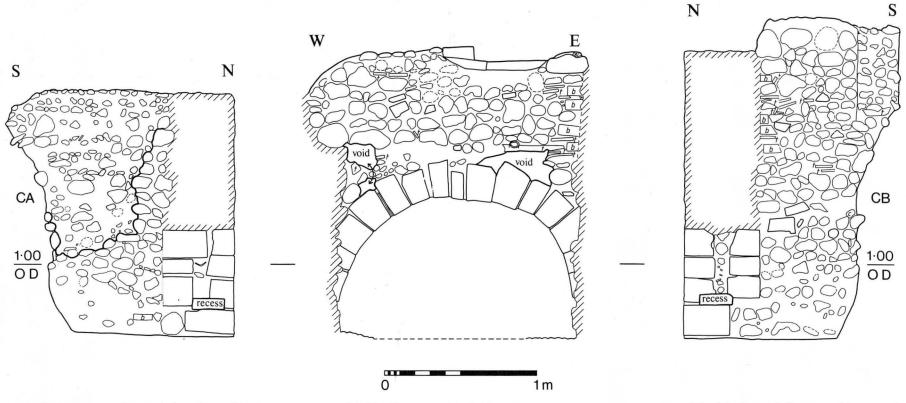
Building 2100. Internal elevations of latrine turret 2125, CA-CB. The west side (S-N) collapsed during the construction of the Magistrates' Courts and has now been reconstructed. Elevations located on Fig. 25. Scale 1:25.
